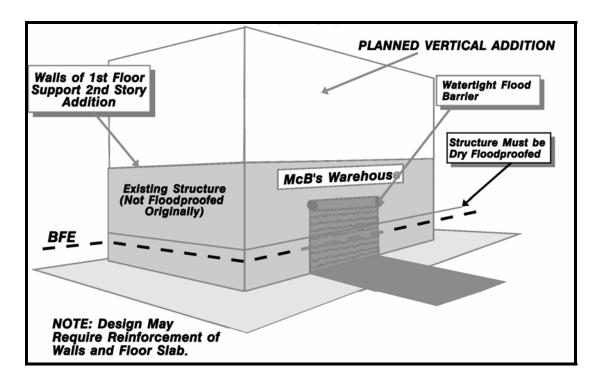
Vertical addition to a nonresidential building. The new floodproofed structure would benefit from post-FIRM flood insurance rates.
